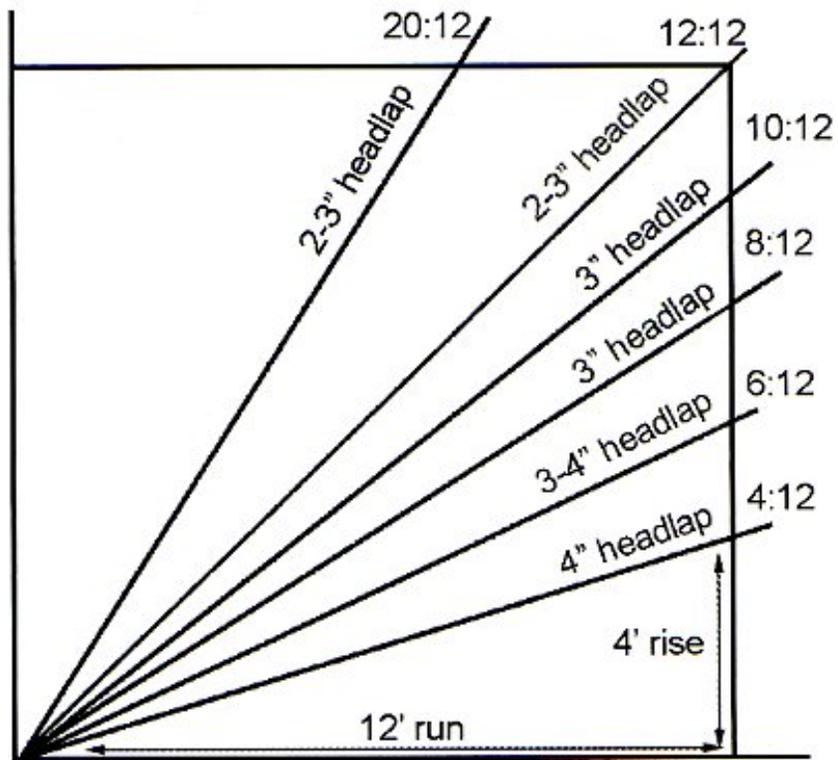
Diagram showing relationship between roof slope and recommended headlap. (Used with permission. Source: Jenkins, /The Slate Roof Bible/, p. 153).
